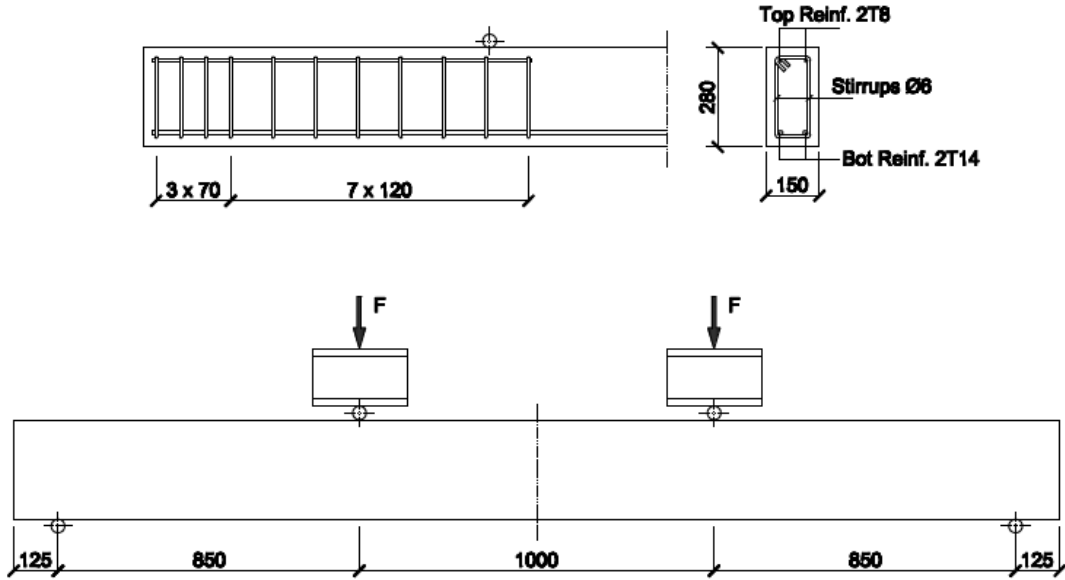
Geometrical description of the tested RC beams and steel reinforcement layout.
